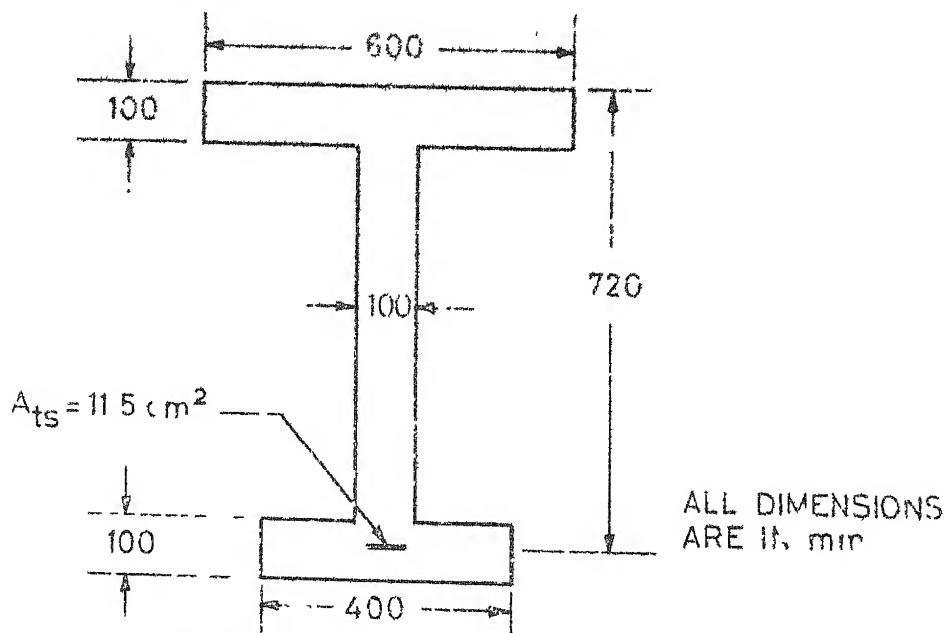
TYPICAL PRESTRESSED CONCRETE SECTION (IDEALISED)
